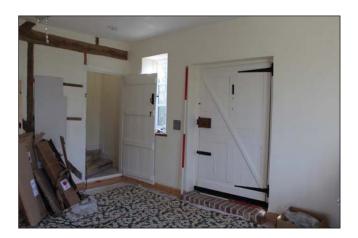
View to front door and stairs, looking east, Scales: 2m and 1m.
